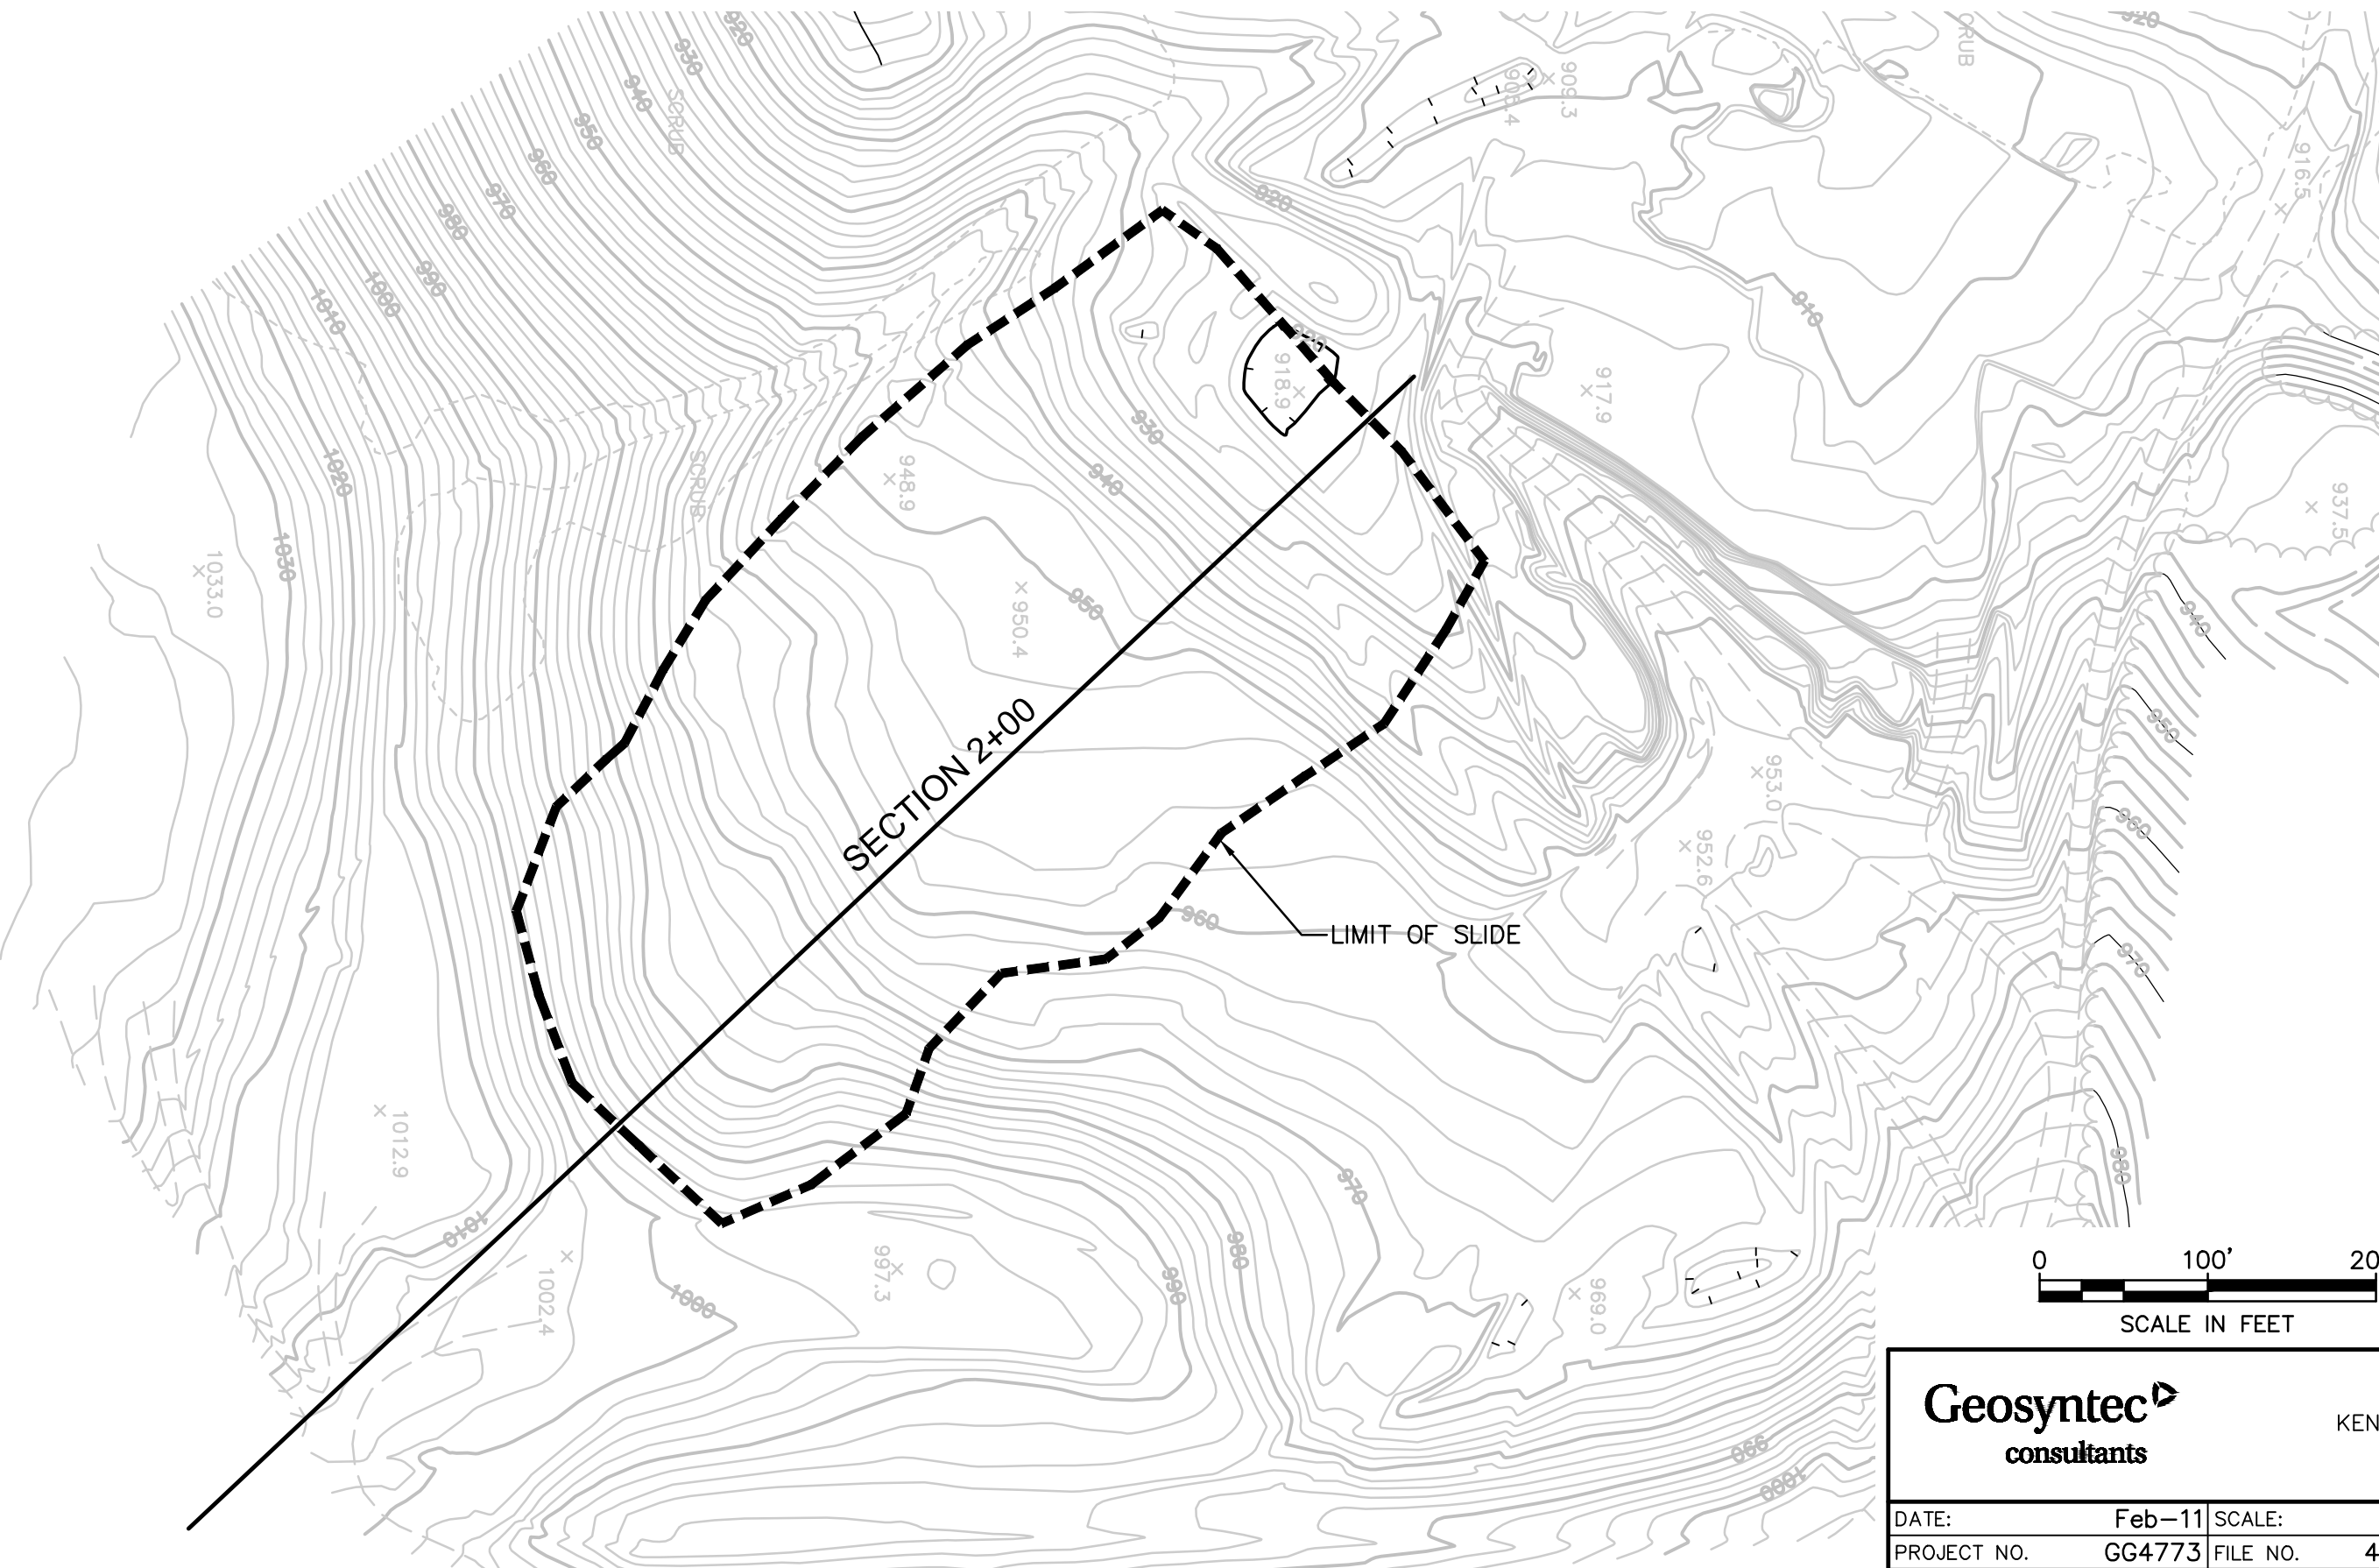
MATLOCK BEND LANDFILL - SITE PLAN
